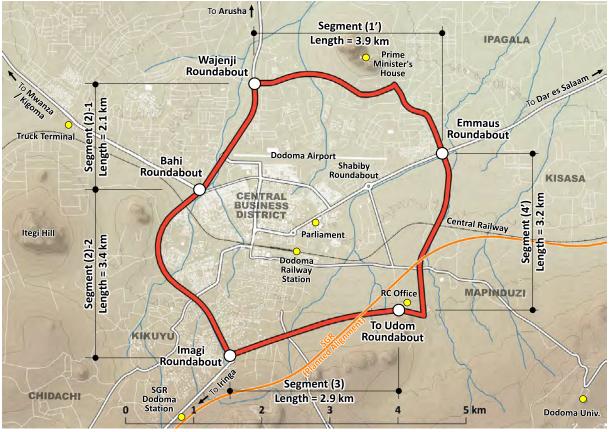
Proposed Road Alignment of Inner Ring Road
